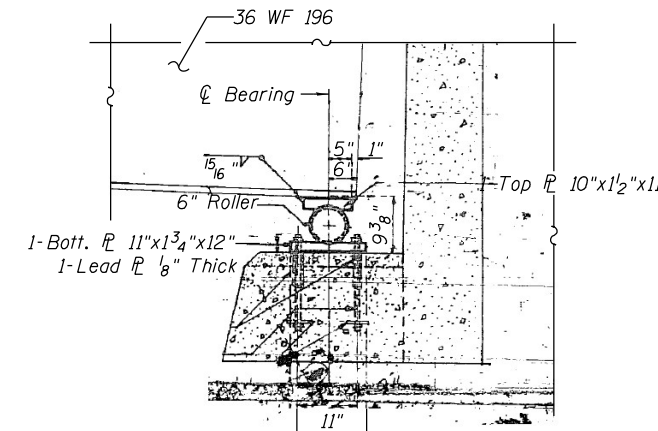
DETAIL OF BOTTOM PLATES FOR PIER C17
